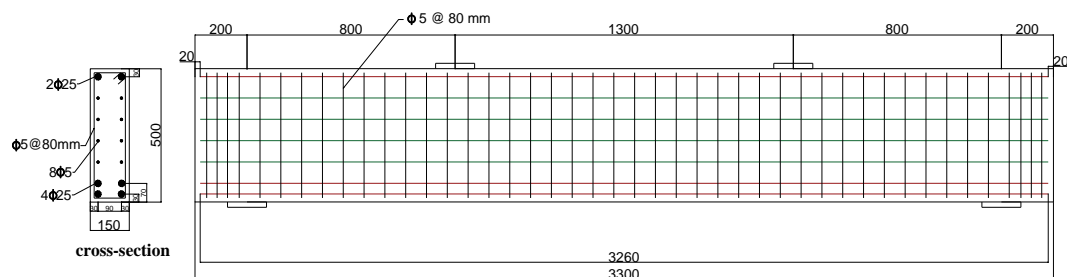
Details of a typical specimen with internal shear reinforcement (dimensions in mm)
